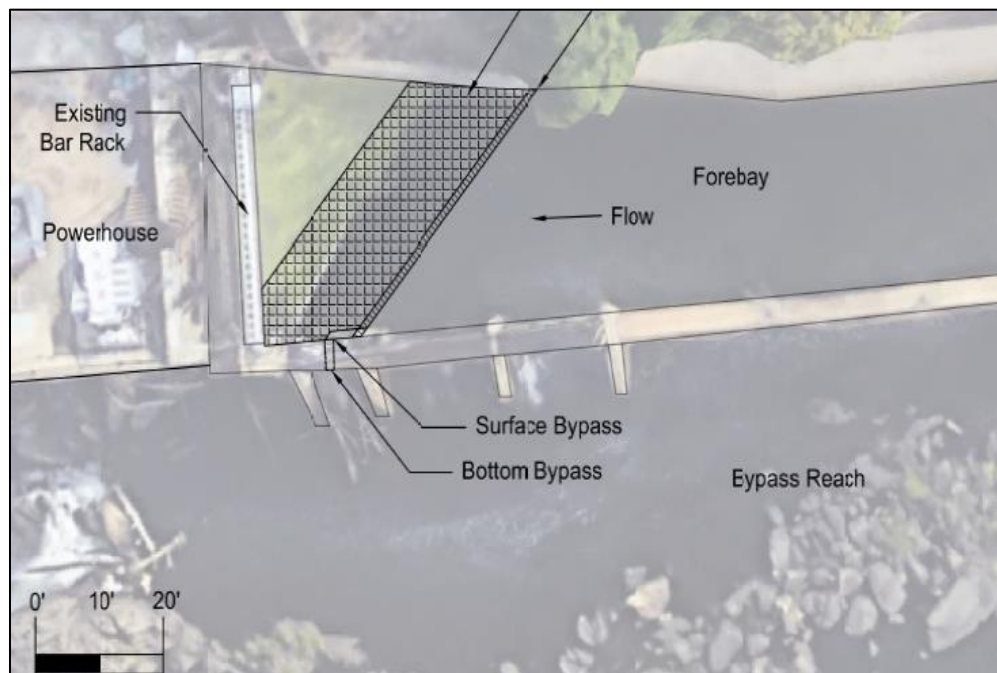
Conceptual design of an angled bar rack installed at Mine Falls (plan view).
